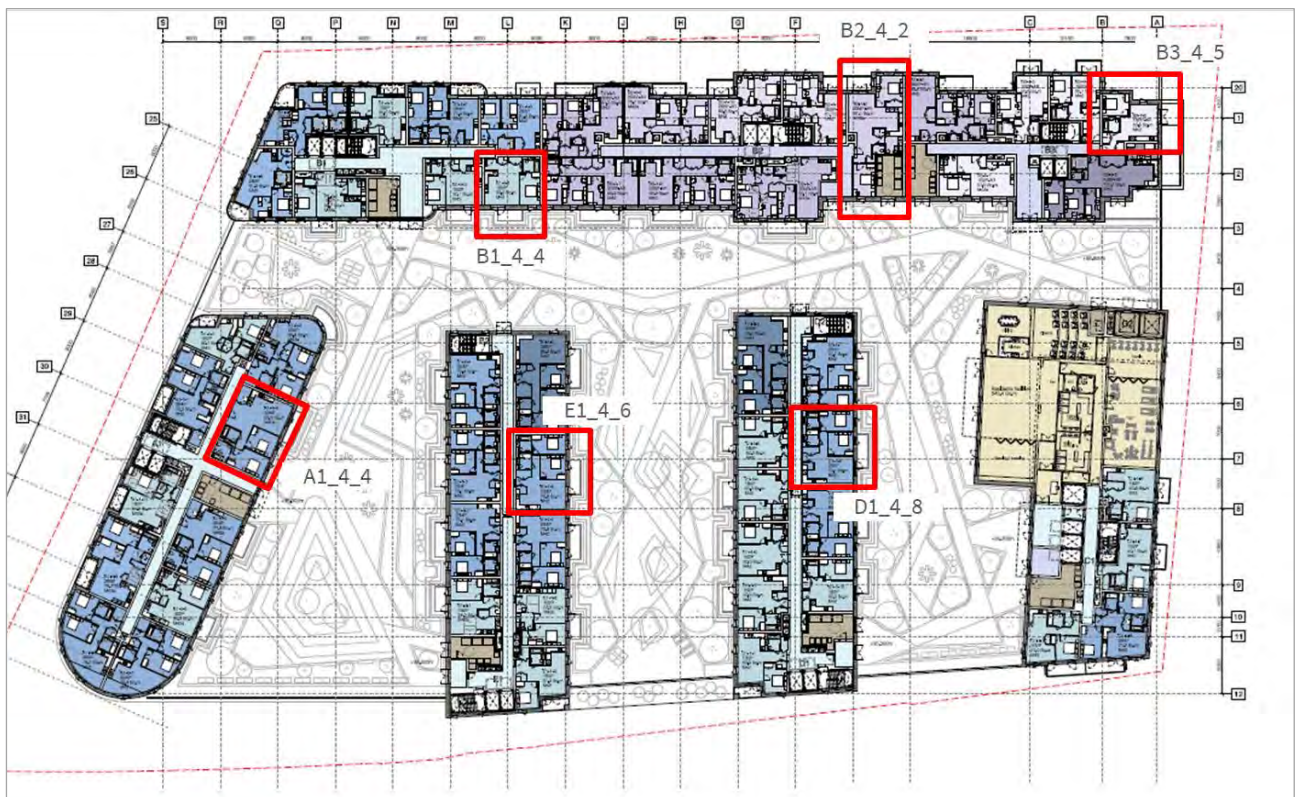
4th floor typical floor plan indicating selected units tested (Source: Patel Taylor Architects received on 20.07.2020).
